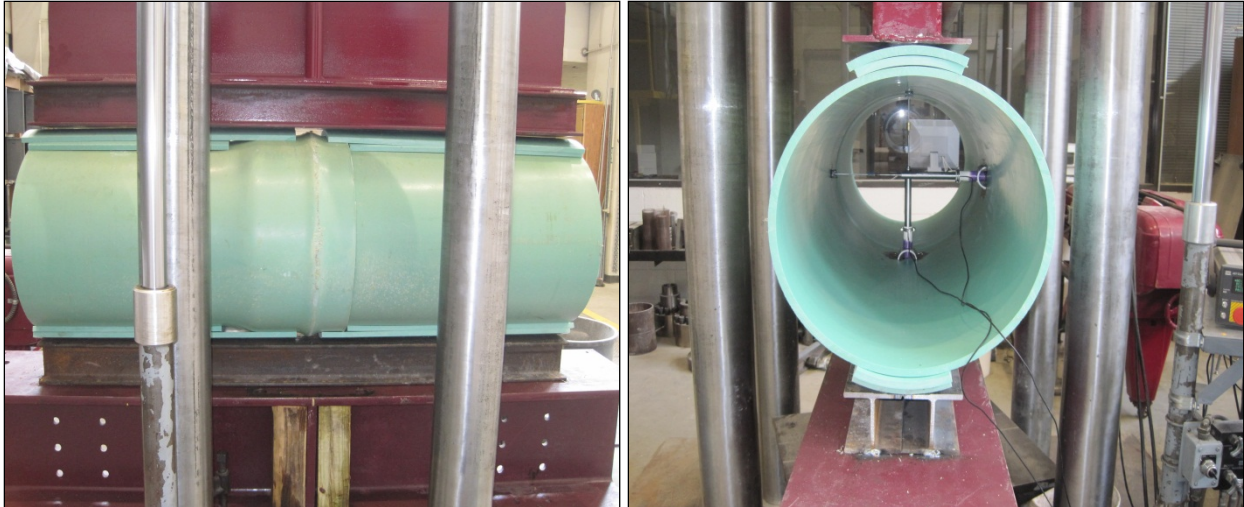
Parallel Plate Loading Test Setup of Jointed PVC Pipe.
